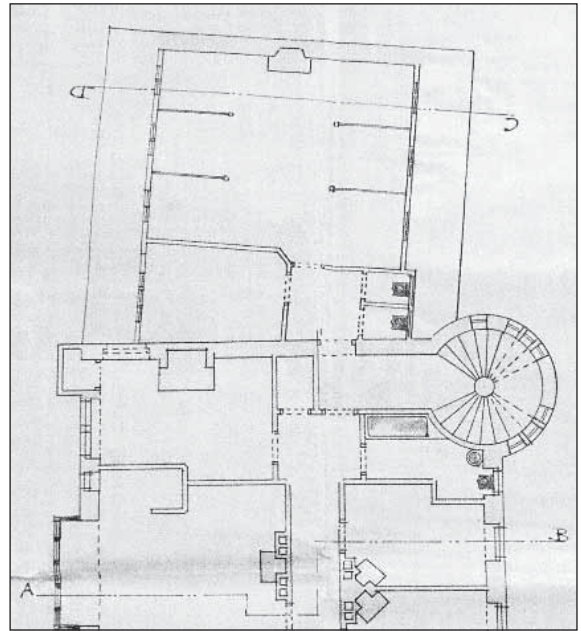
Extract from fourth floor plan of 'double tenement' in south west corner of Ramsay Garden, showing original dormitory style accommodation. (ECA, Dean of Guild petition, 11 June 1892.)
